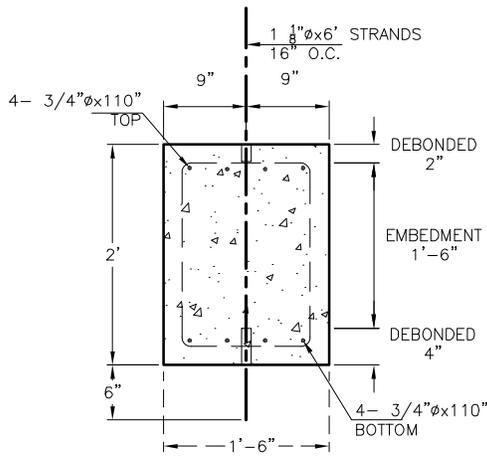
1/2 in. LBPT Specimen dimensions and strand layout
